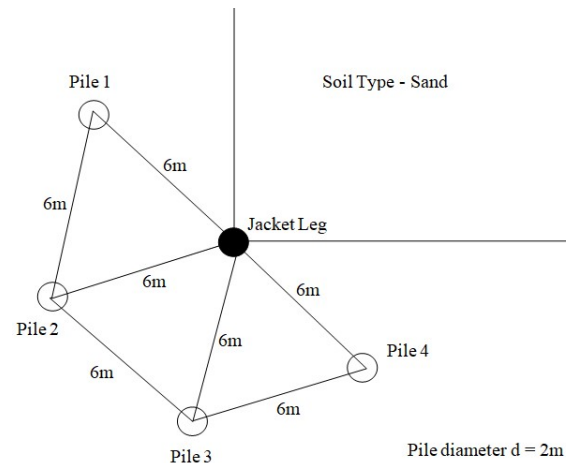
Plan view of skirt piles configuration at base of jacket structure in sand
